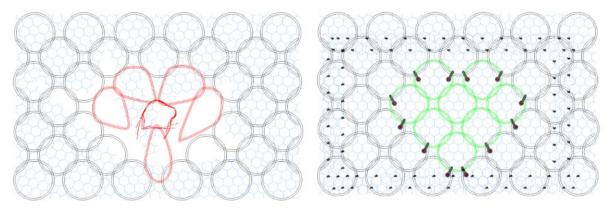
Repairing a damaged section within the ring-net using a partial panel (Maccaferri, 2017)
